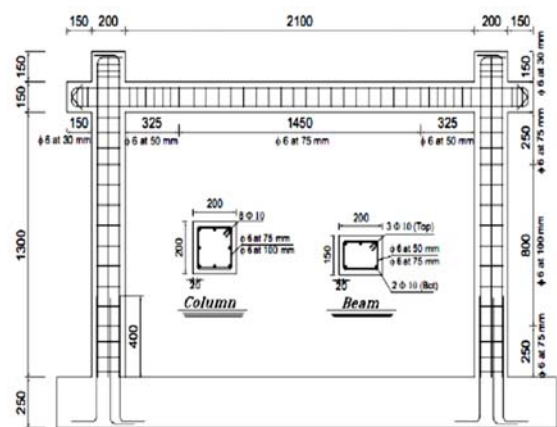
Executing details of reinforced concrete frame (mm) [13].
